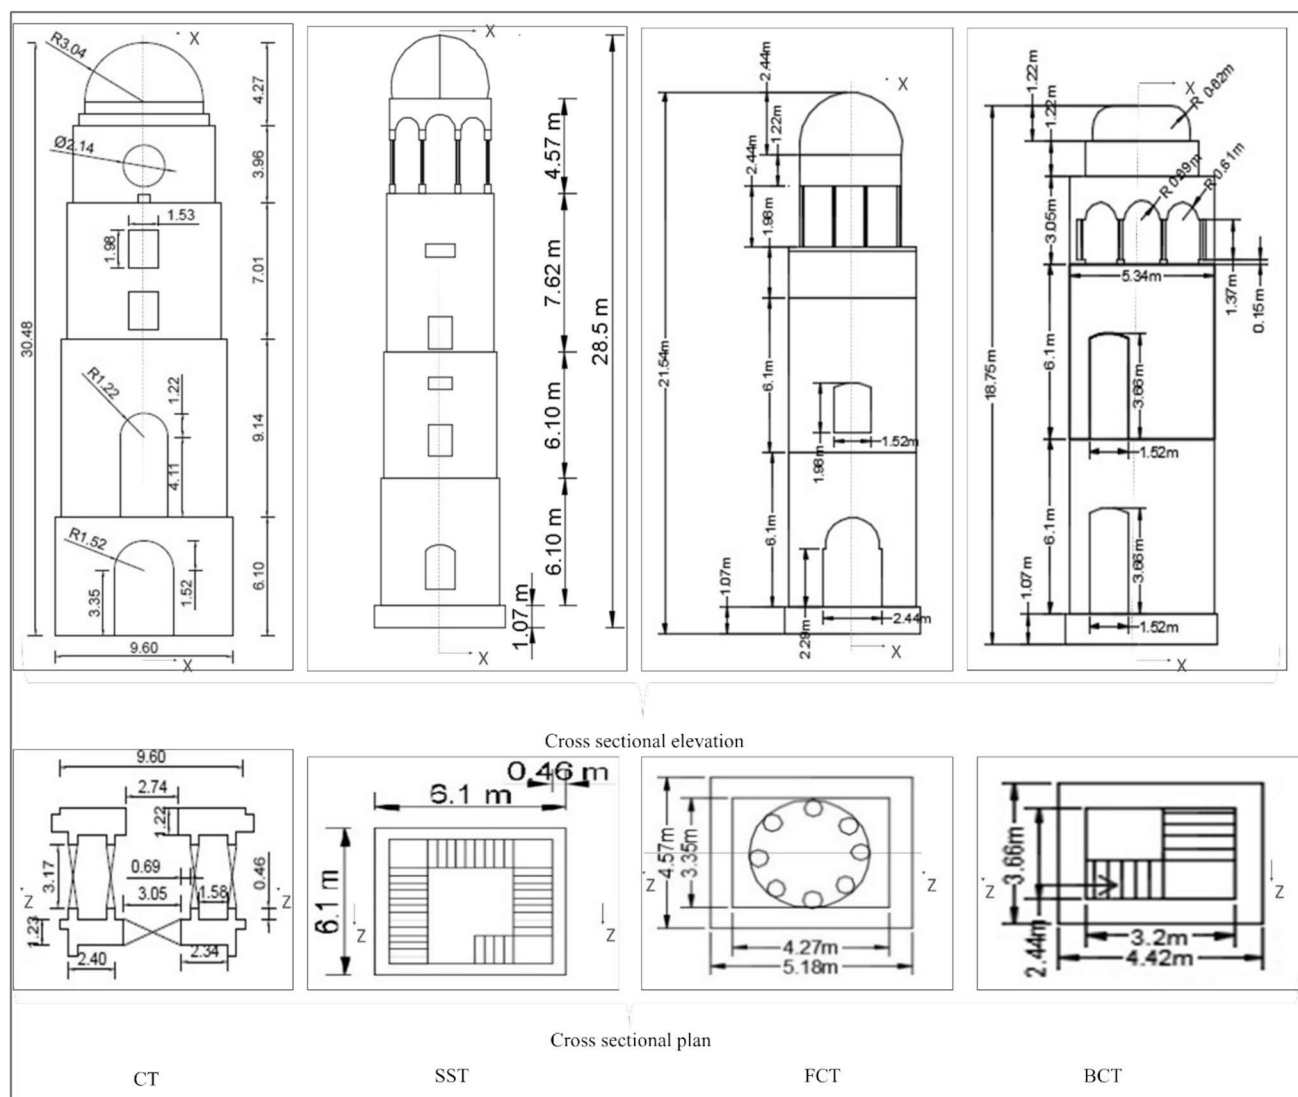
Geometrical cross-sectional plan and elevation drawing of towers
